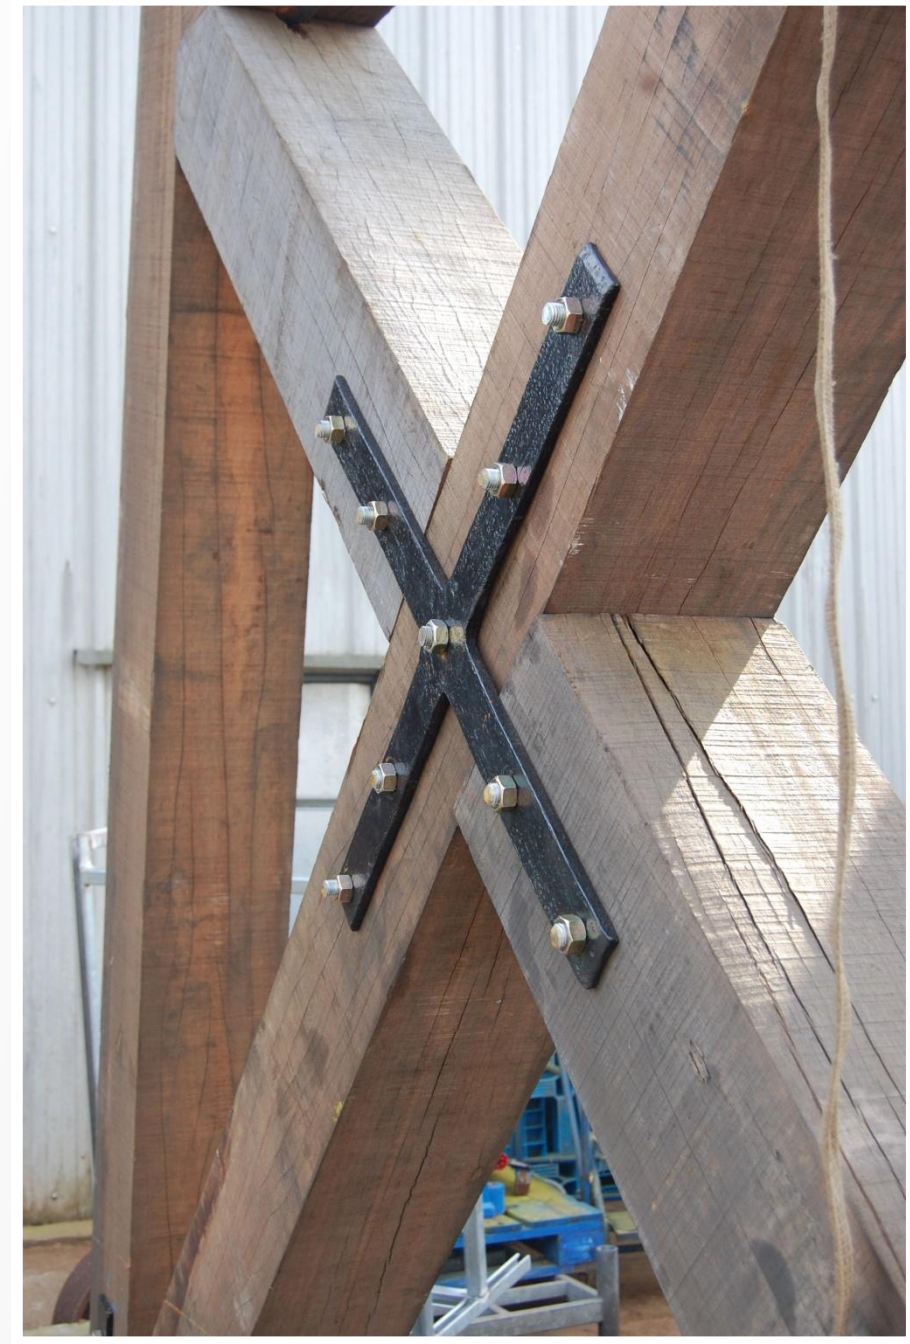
03/09/2010 Detail of new A-frame cross-brace.
